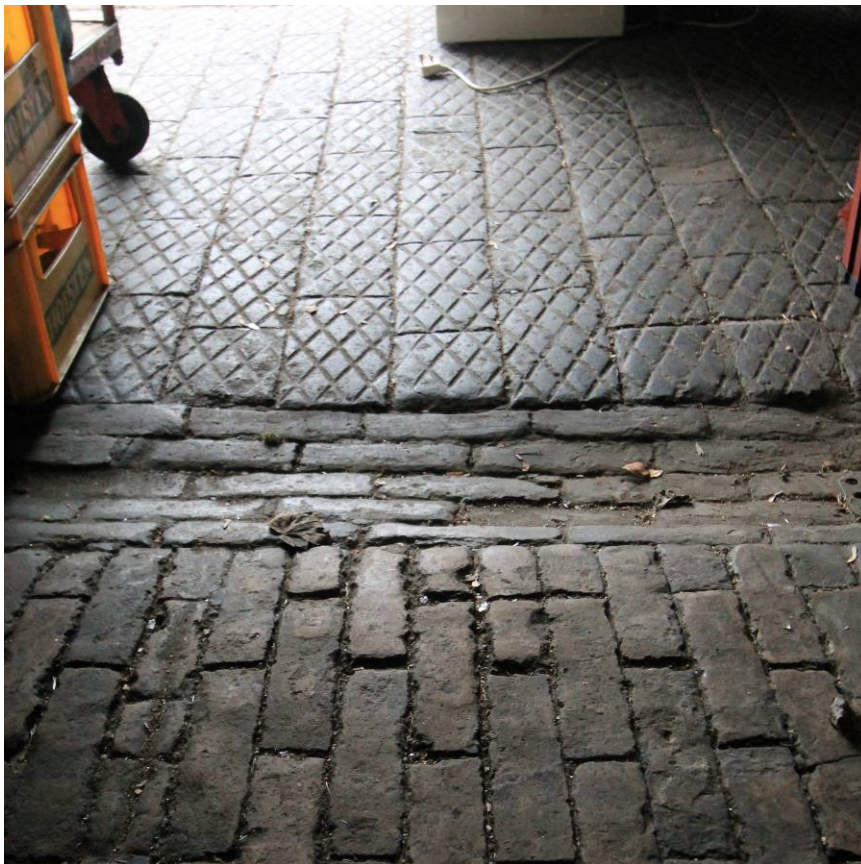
Brick Sett Stable floor and Urine Gulley (A5)
